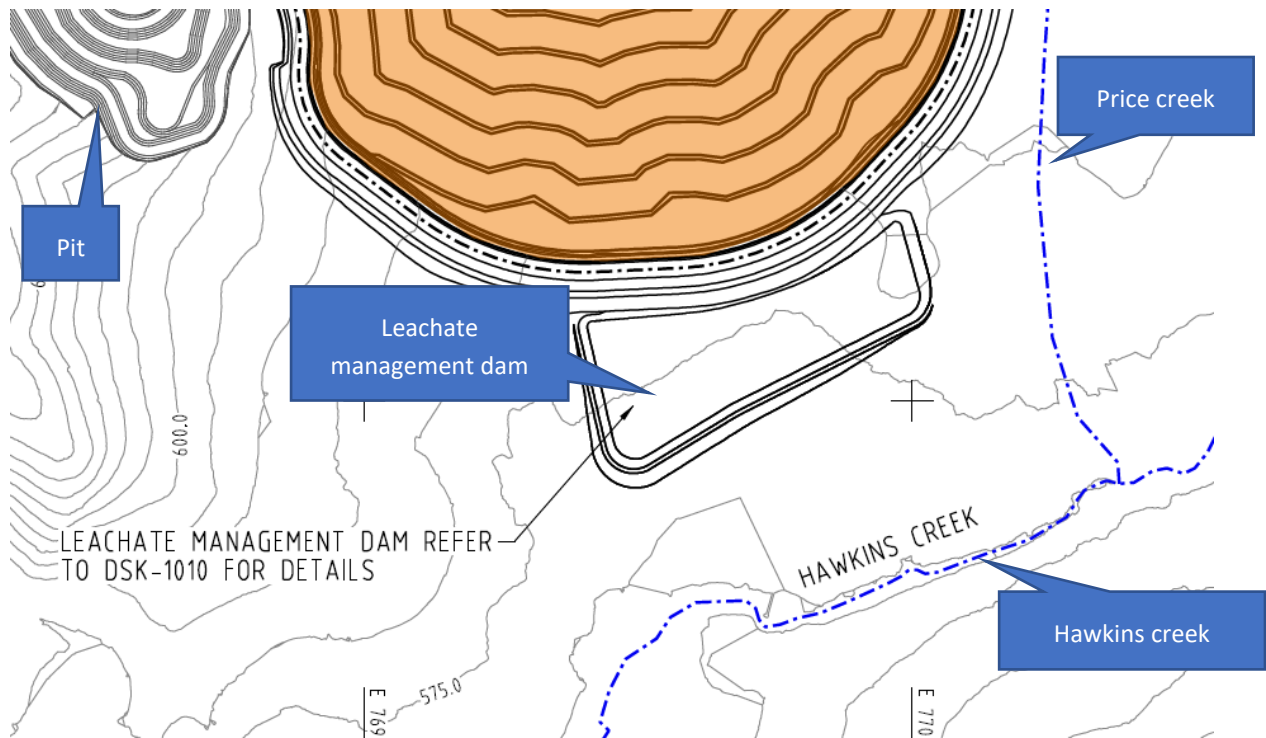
WRE plan showing 5 m elevation contours. Source – adapted from DSK-1002 (Advisian, 2020, p. 35)
